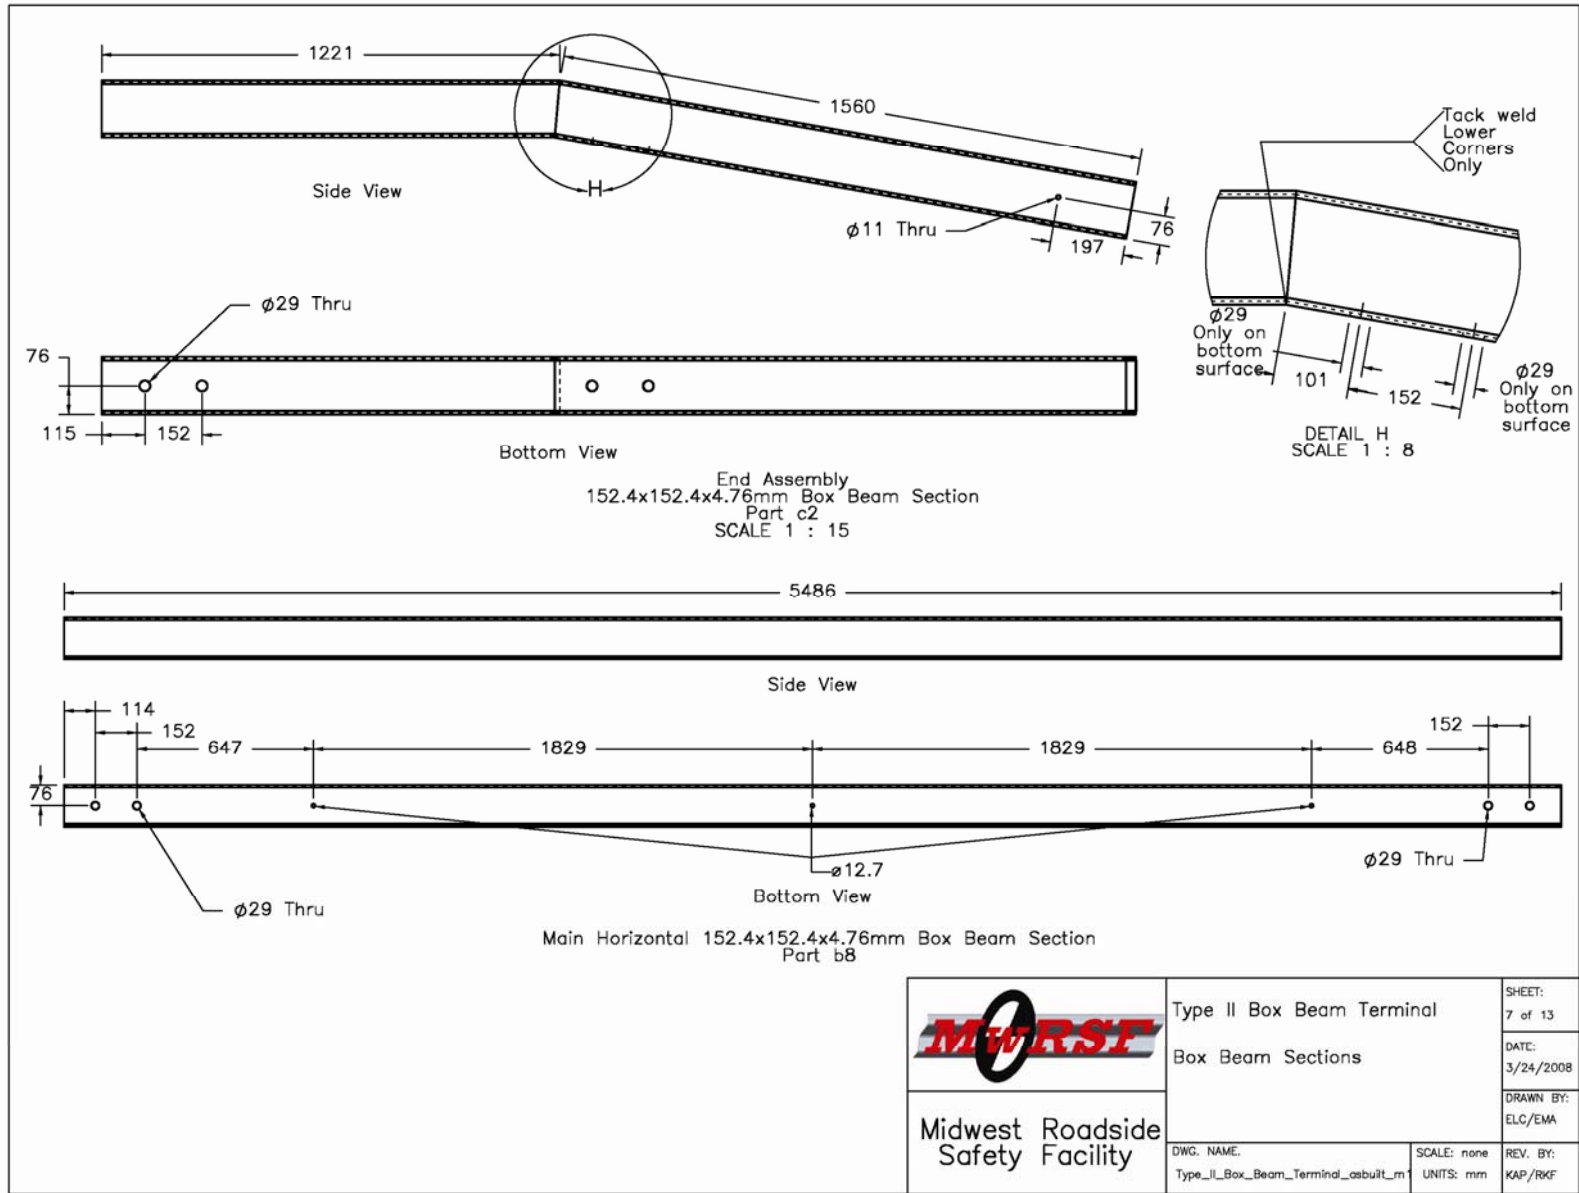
Type II Box Beam System Details, Test No. NYBBT-1
